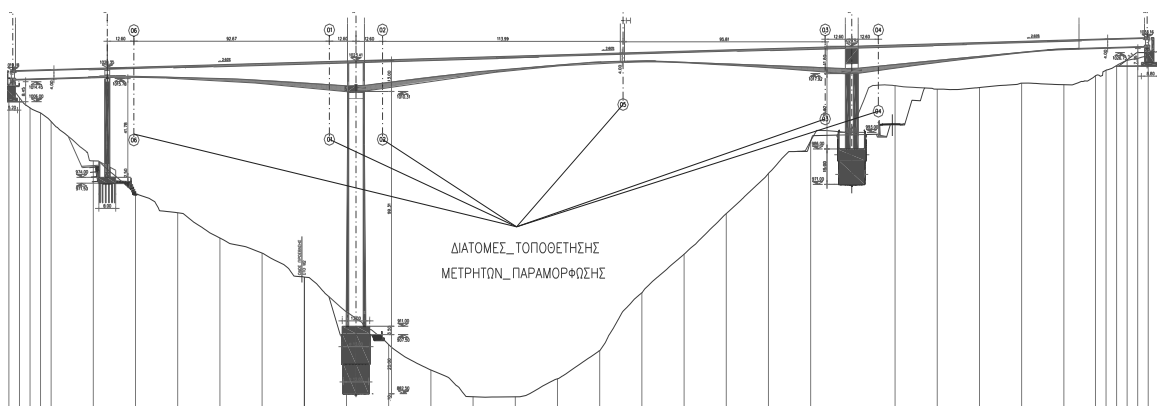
Longitudinal section of Metsovo ravine bridge of Egnatia Motorway.
